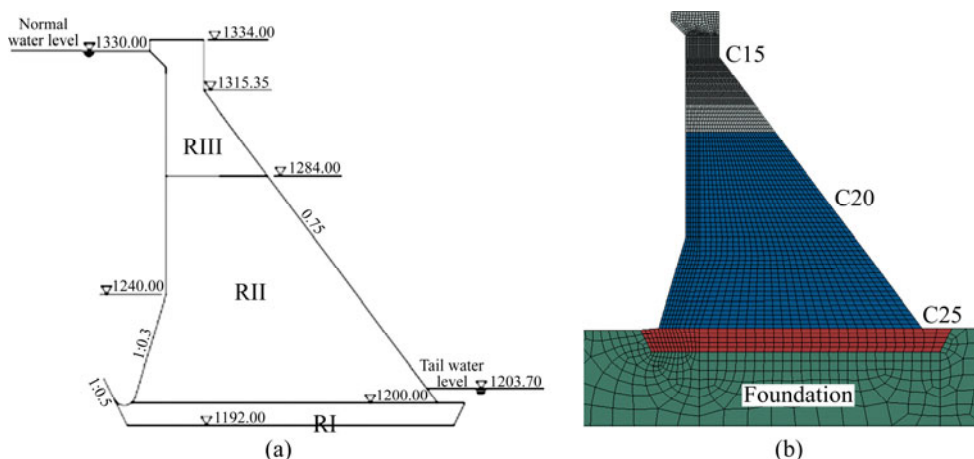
Dam section and finite elements (Unit: m): (a) Dam section; (b) Finite element modal (2D)
